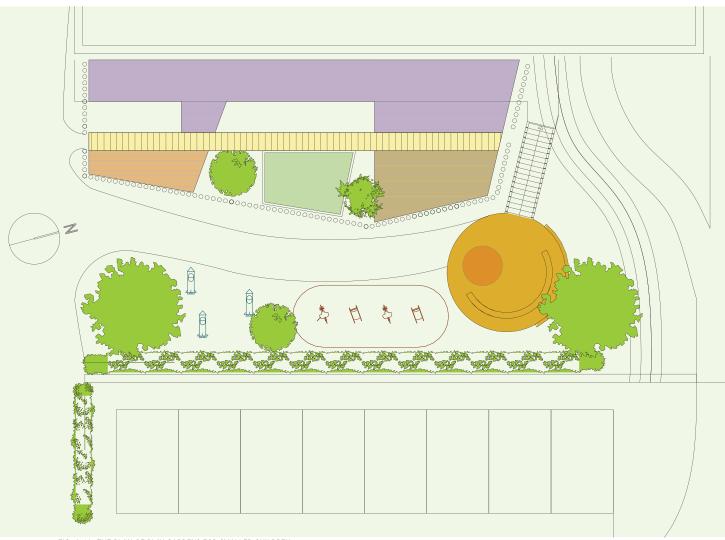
THE PLAN OF PLAY GARDENS FOR SMALLER CHILDREN.
